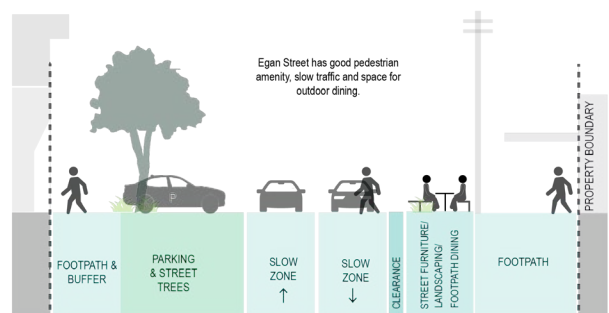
Egan Street concept streetscape. Concept only, subject to further detailed investigation, design and approval.
